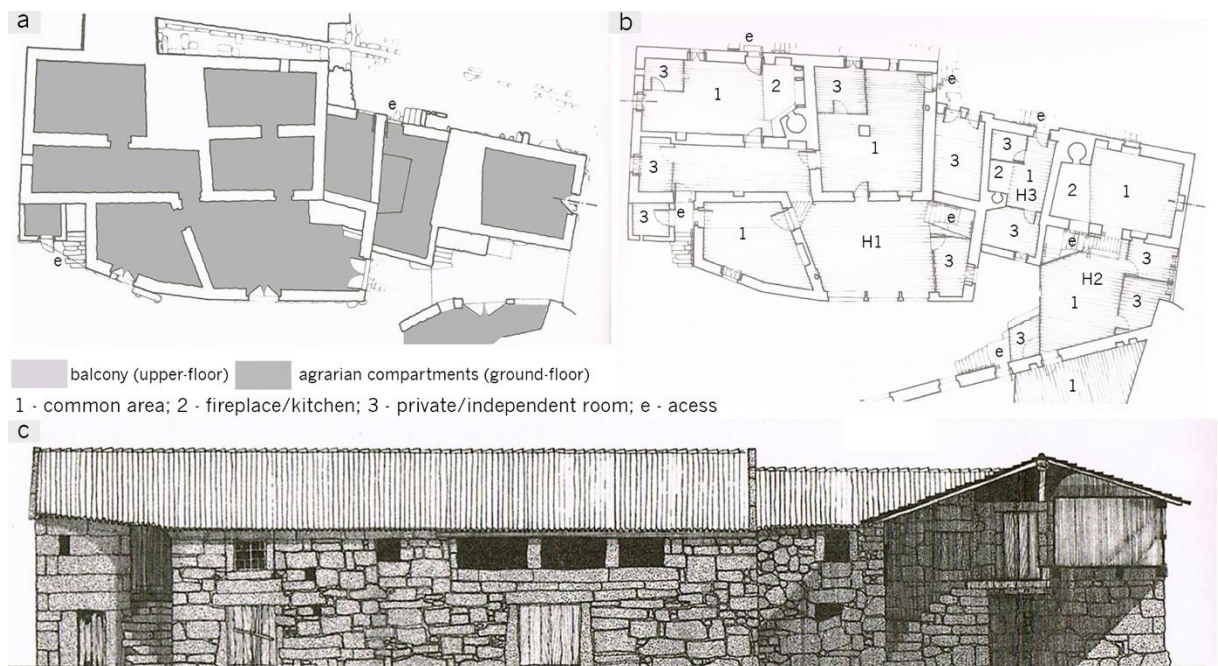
Literature example of a group of highland houses with two complex houses (H1 and H3) and a simplified house (H2) (Vilarinha das Furnas) [138]: (a) ground-floor; (b) upper-floor; (c) east elevation.
